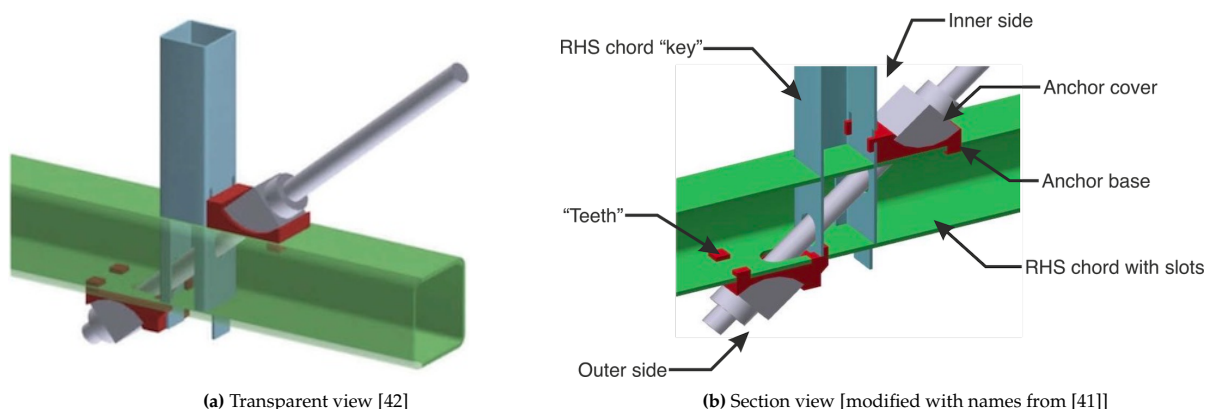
View of components of non-welded N type RHS truss connection
